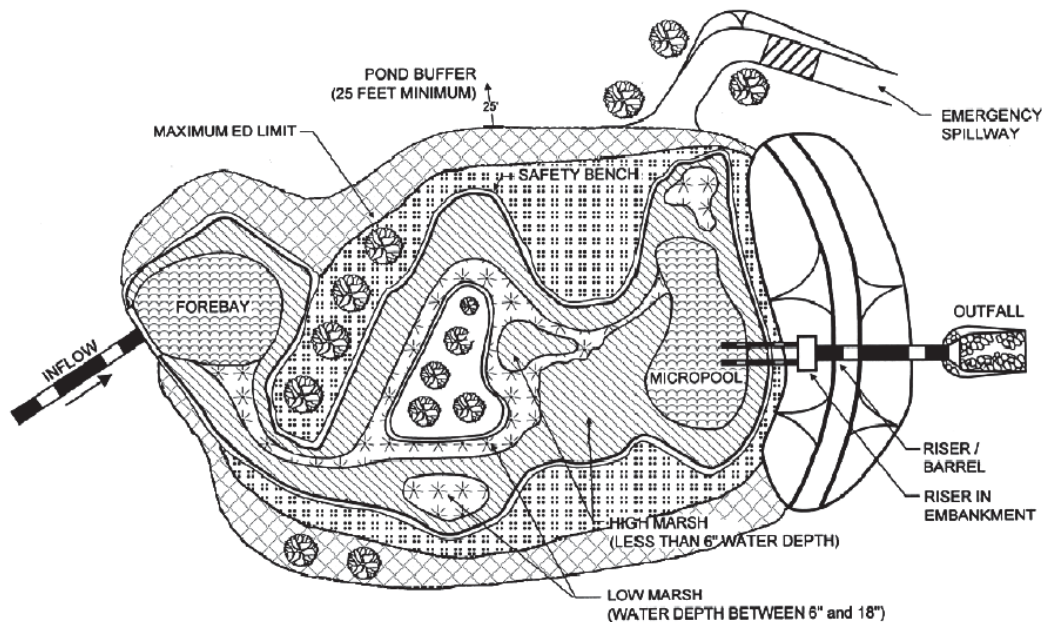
Plan View of Hydrologic Zones around Stormwater Wet ED Pond
